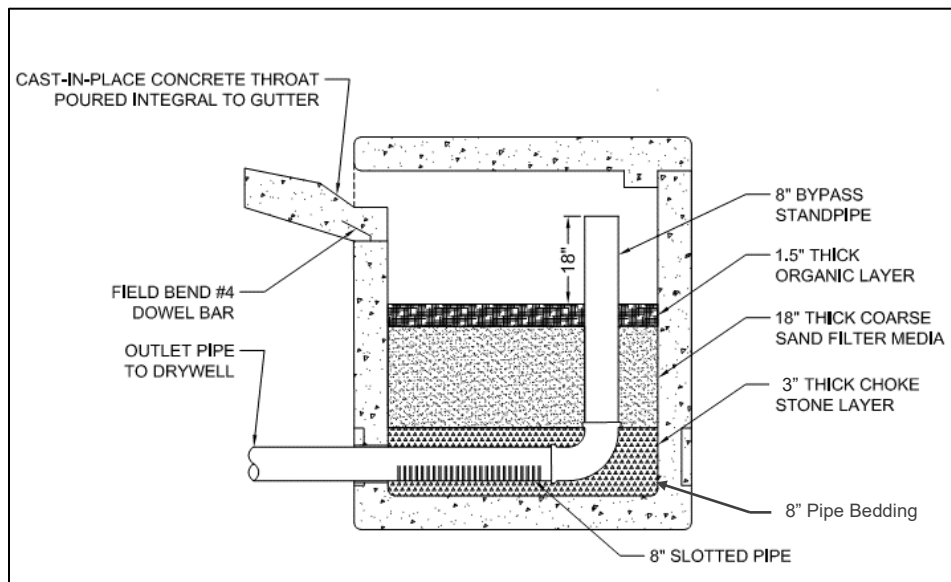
Cross Section of Sand Filter in Sidewalk Vault
